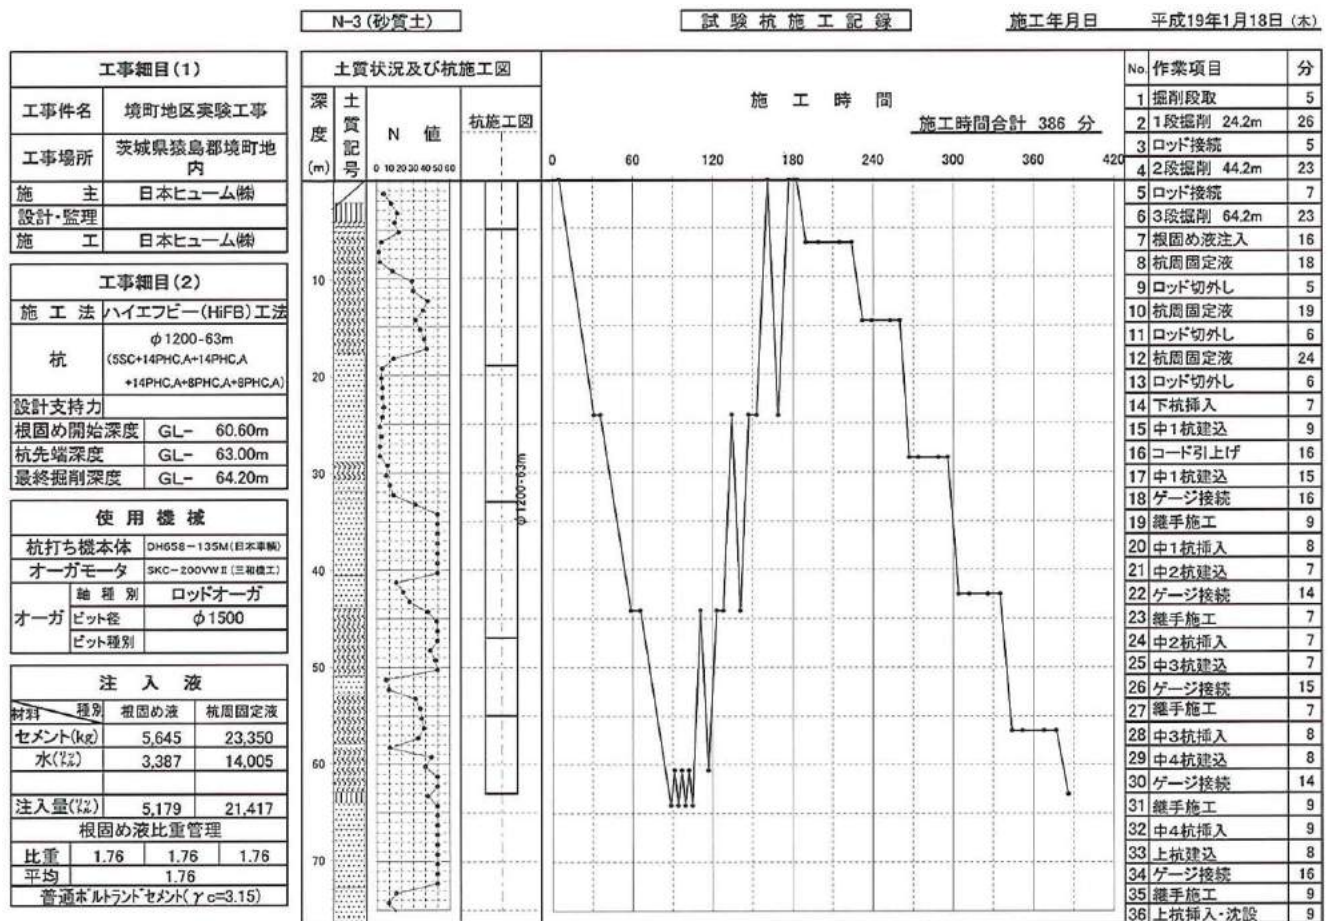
Typical construction records of a prebored PHC pile (in Japanese)
